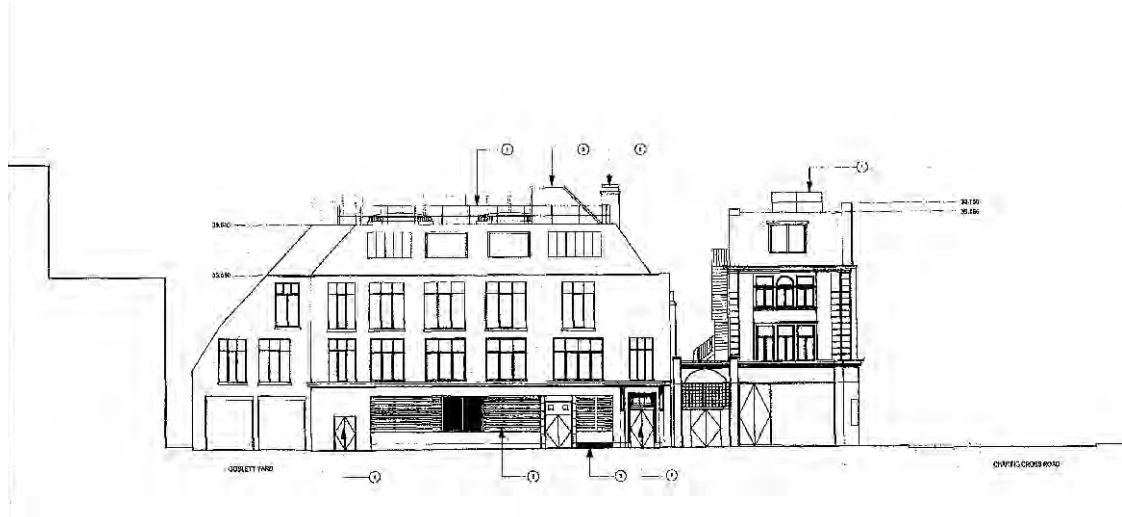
South elevation of Building 3, onto Goslett Yard, before the addition of the link block c 2003
